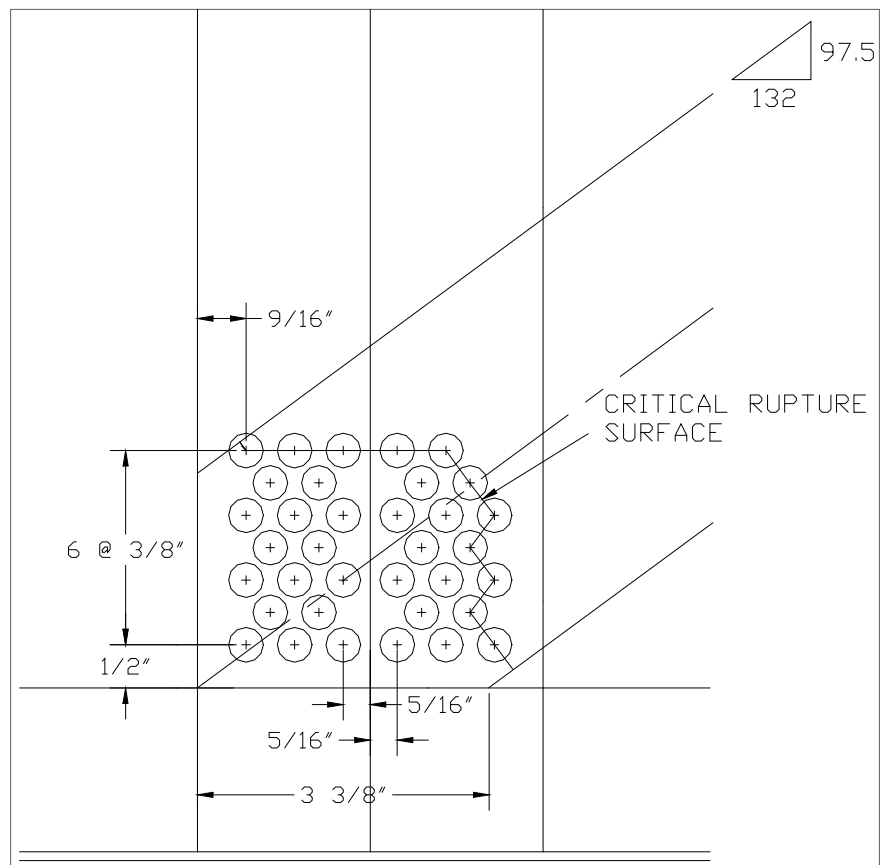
Elevation view of the second-row anchor stiffener plates.
